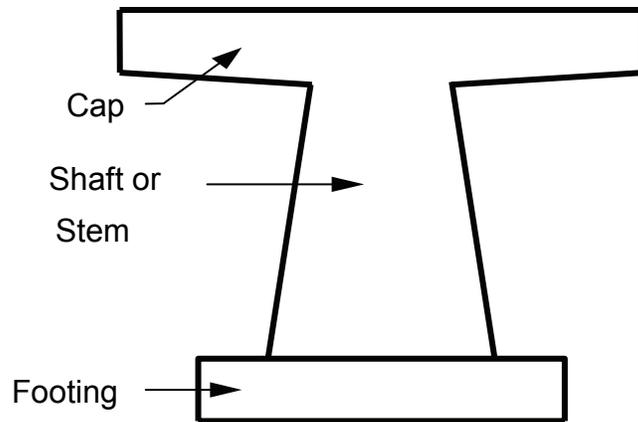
Single Stem Pier (Cantilever or Hammerhead)
